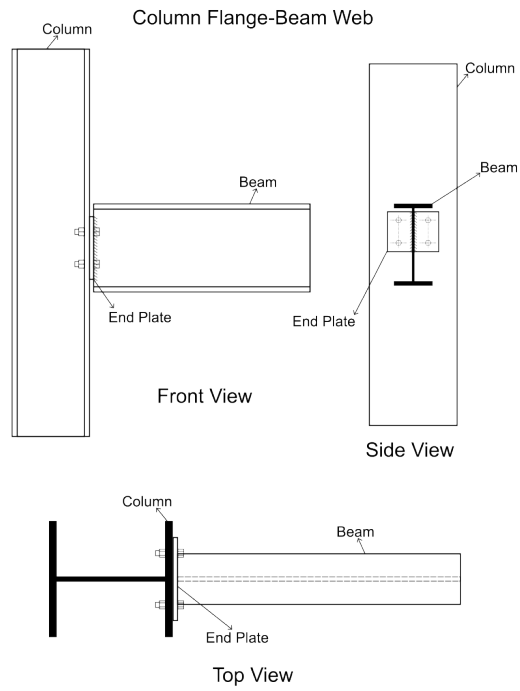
End Plate Connection – Column Flange-Beam Web
